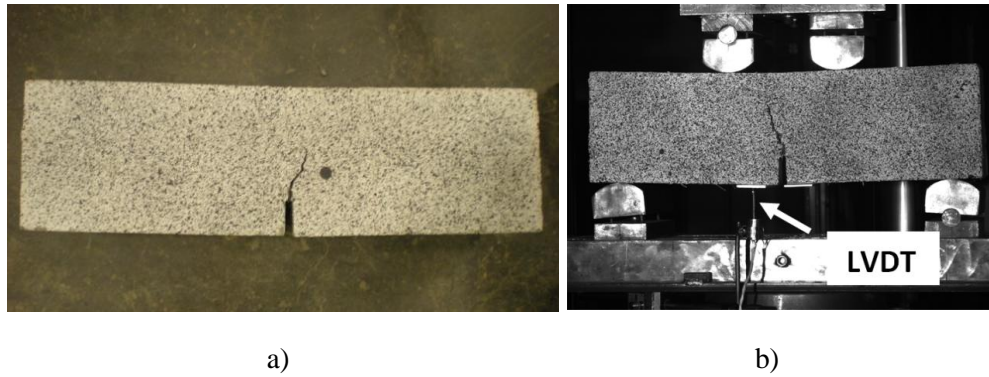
a) Prism Speckling for DIC System and b) ASTM C1609-10 Flexural Test Setup with LVDT
